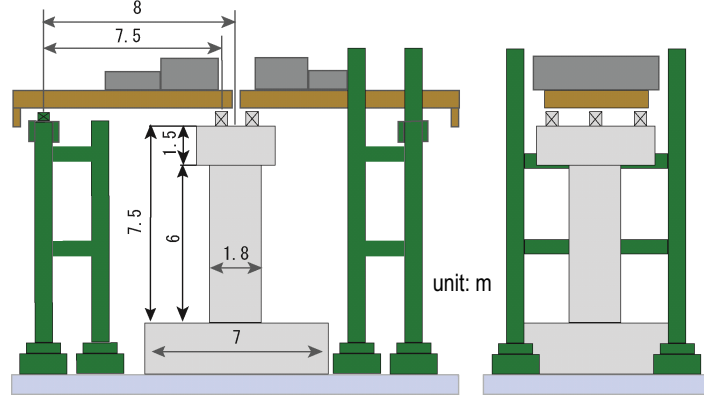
Schematic view of C1-1 Reinforced Concrete Bridge Pier.
